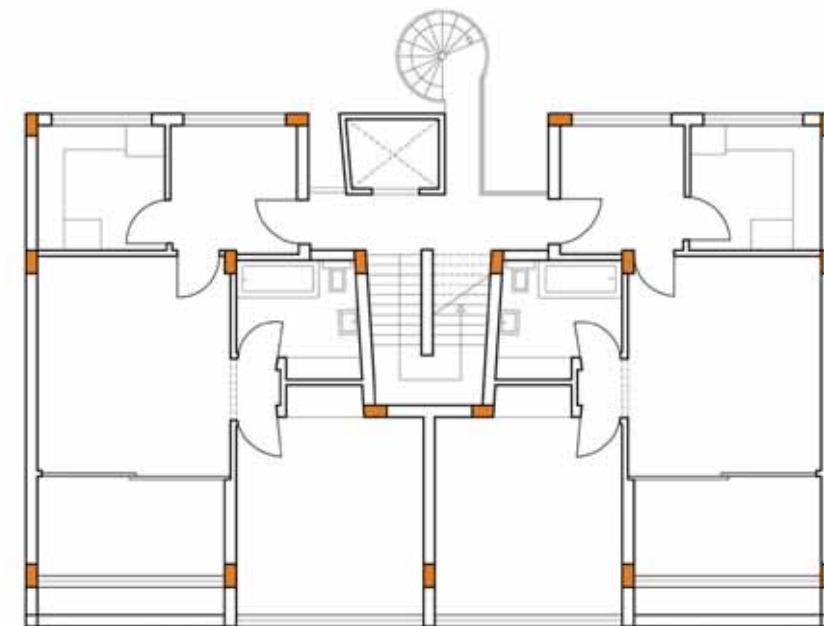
Existing first floor plan indicating the structural column system (Author, 2010).
